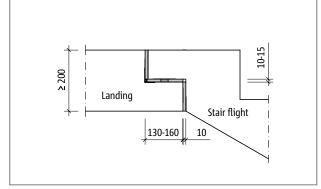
Schöck Tronsole® type F: Design variant superelevated stair connection
